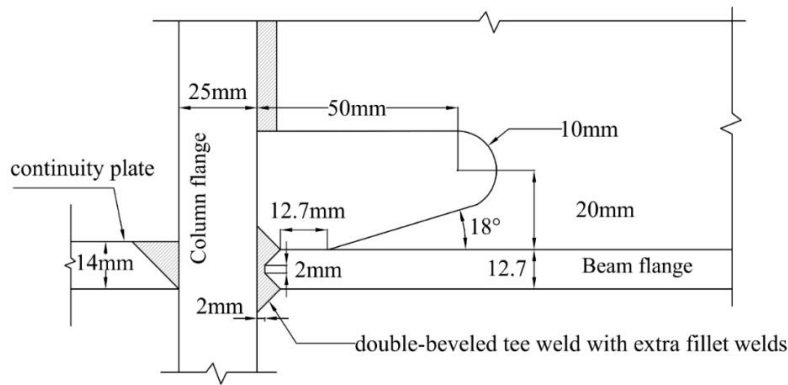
Welding configuration and the weld access hole geometry of the studied joint.
